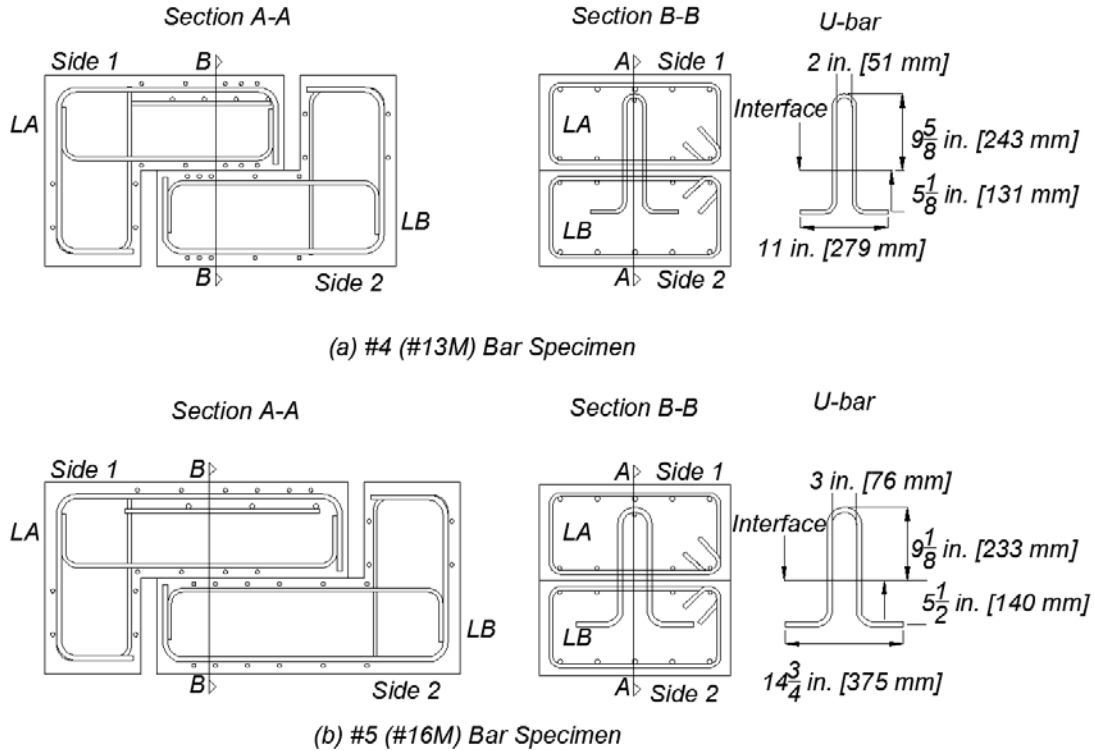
Section cuts detailing reinforcing steel layout and U-bar shear connectors
